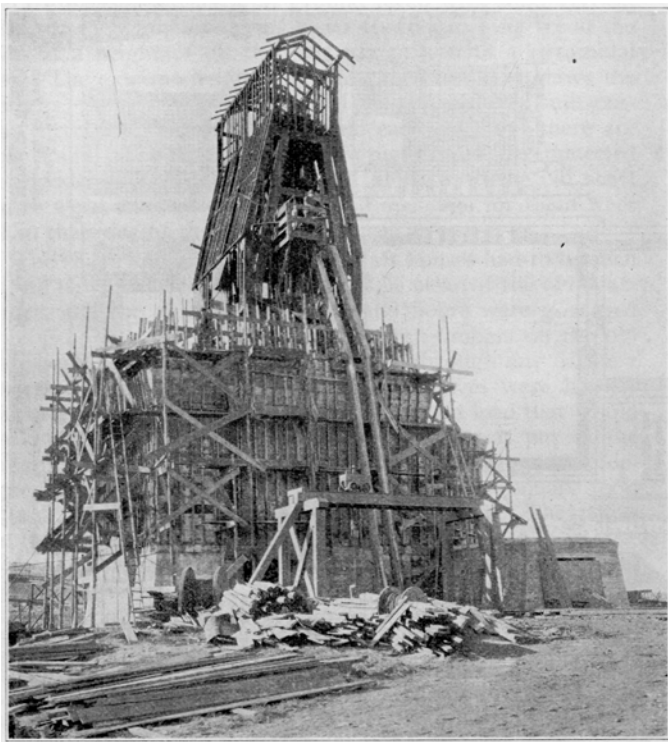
B SHAFT HOUSE UNDER CONSTRUCTION
